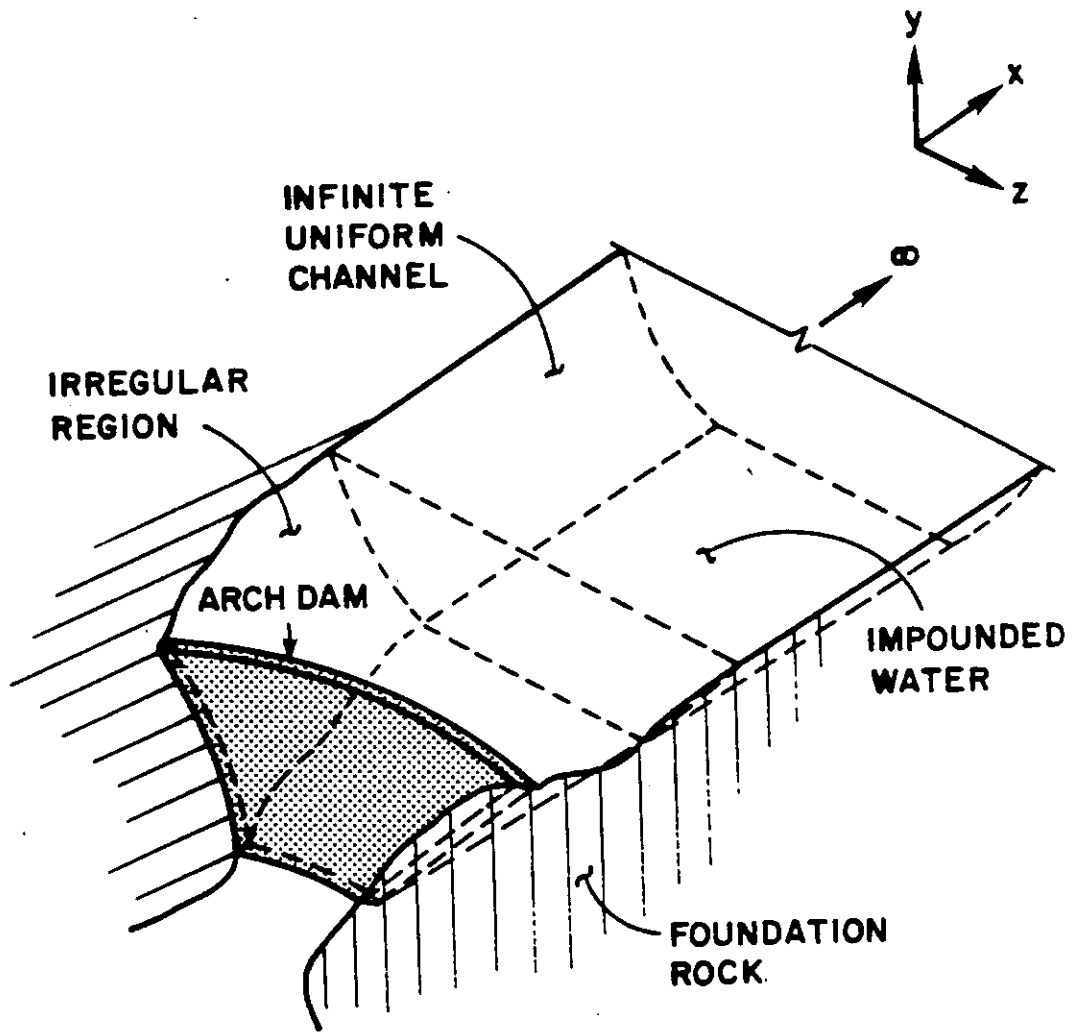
Arch Dam-Water-Foundation Rock System
